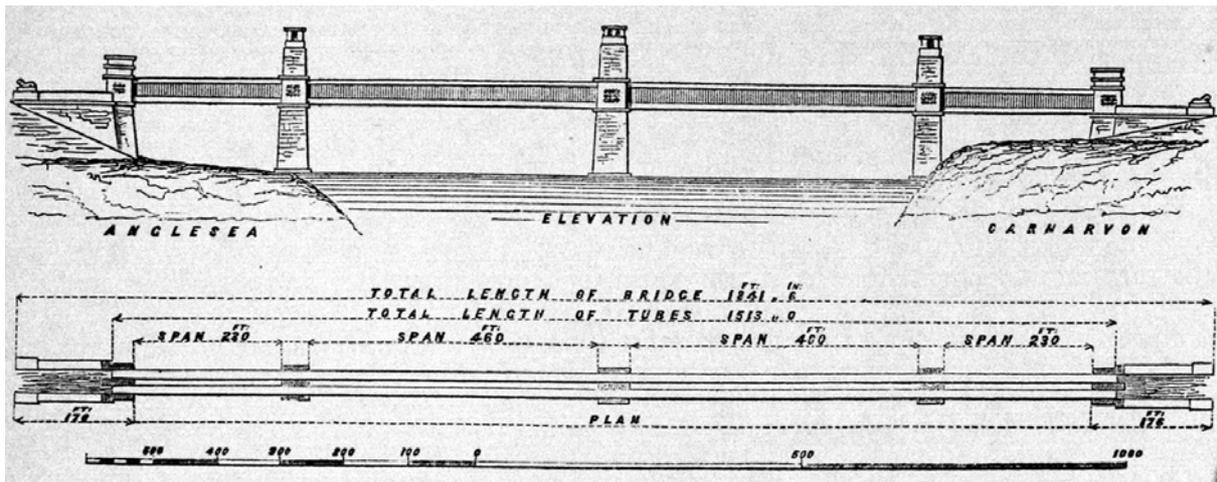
Plan and elevation of final design. Each tube totals 461.2 m (1513 ft) long. (Dempsey)
